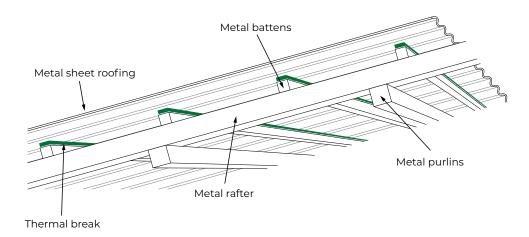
A minimum R0.2 thermal break in a roof construction (insulation not shown).
